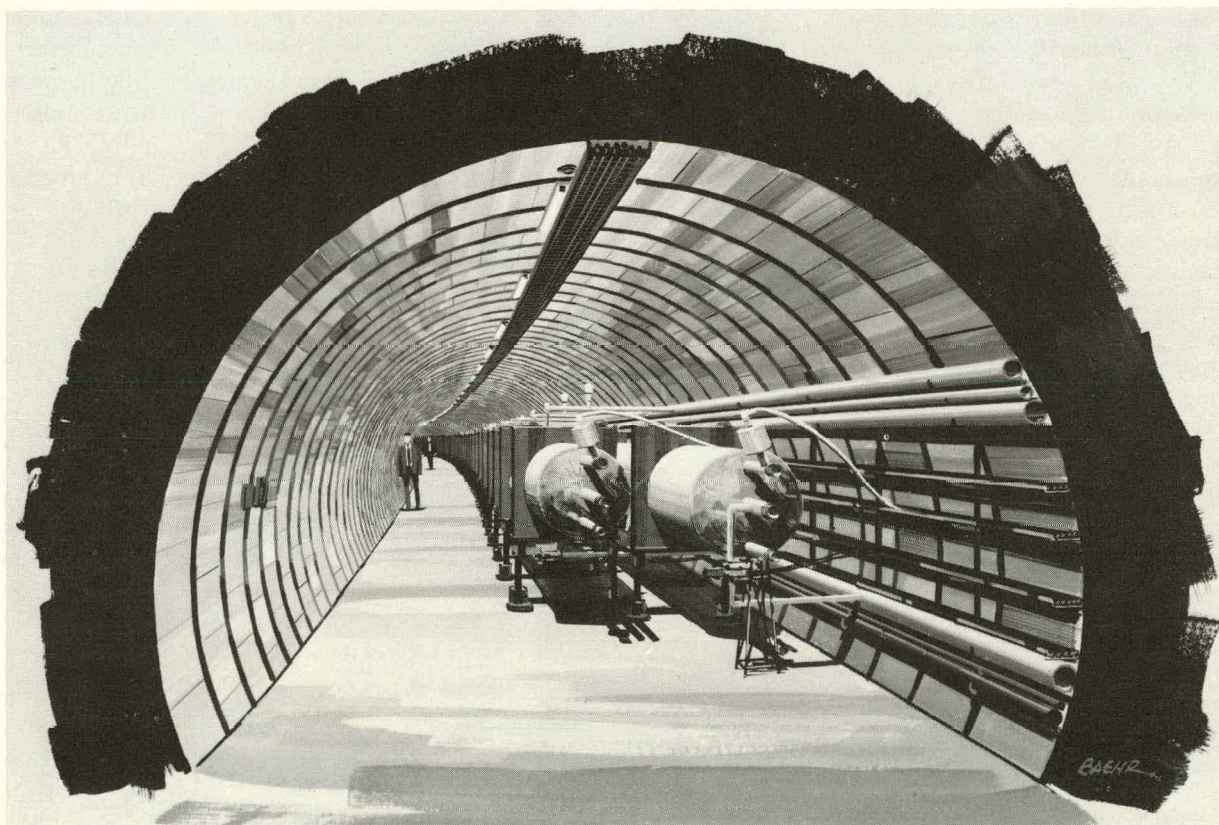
Drawing of typical cross-section of ISABELLE tunnel.
